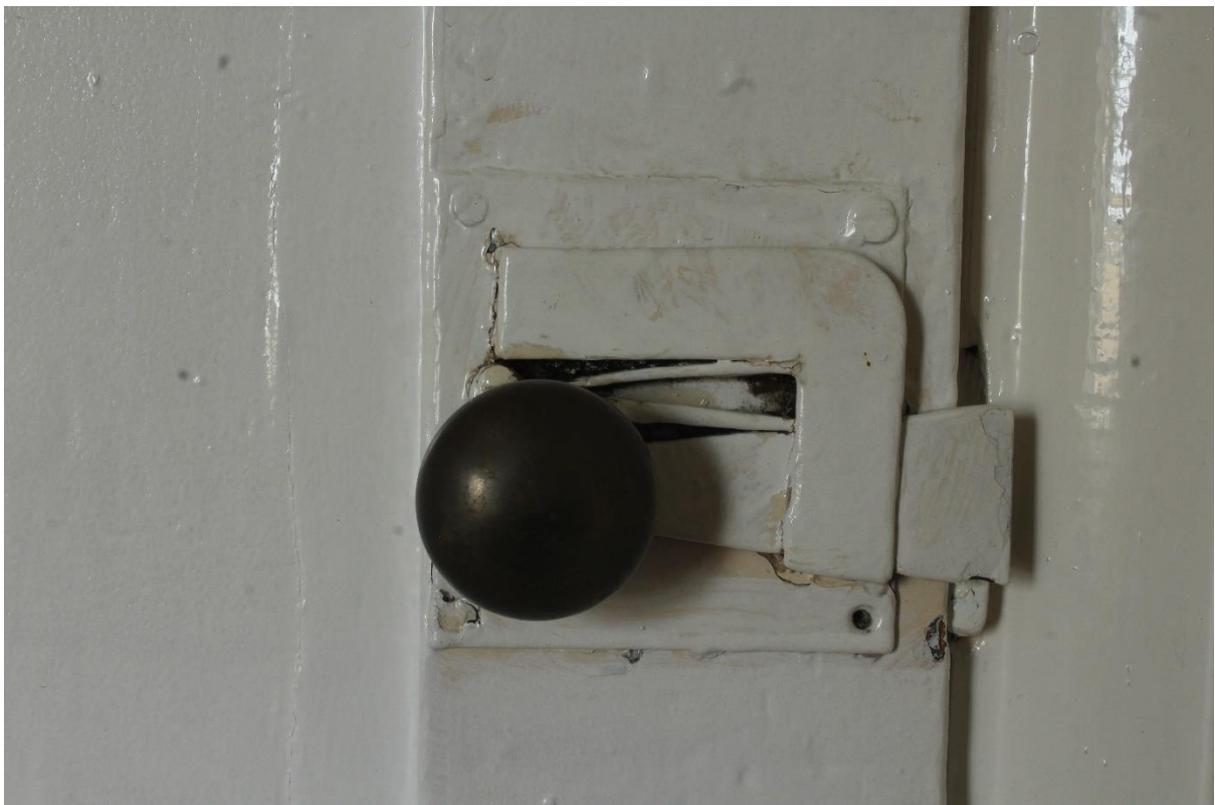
Farmhouse first floor north-eastern bedroom door latch, looking south
